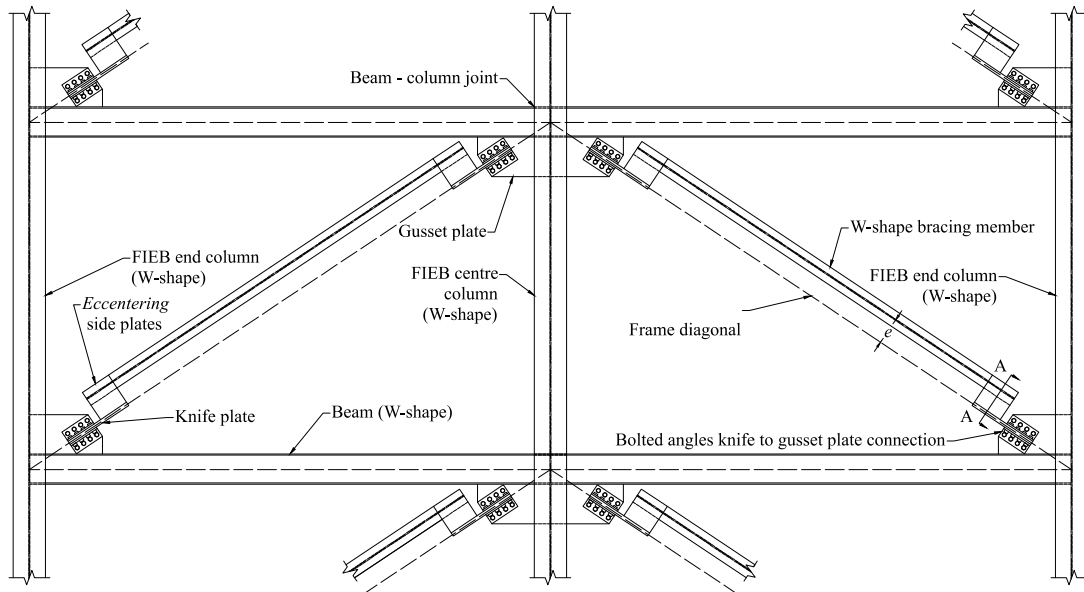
Typical arrangement of a FIEB in chevron with middle column configuration (W-shape bracing members shown).
